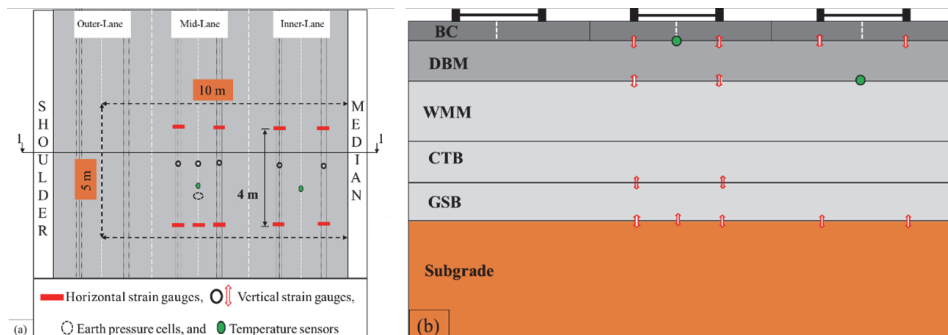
Instrumented pavement section: a) plan showing placement of gauges, b) cross-section at 1-1 showing vertical strain gauges and temperature sensors
